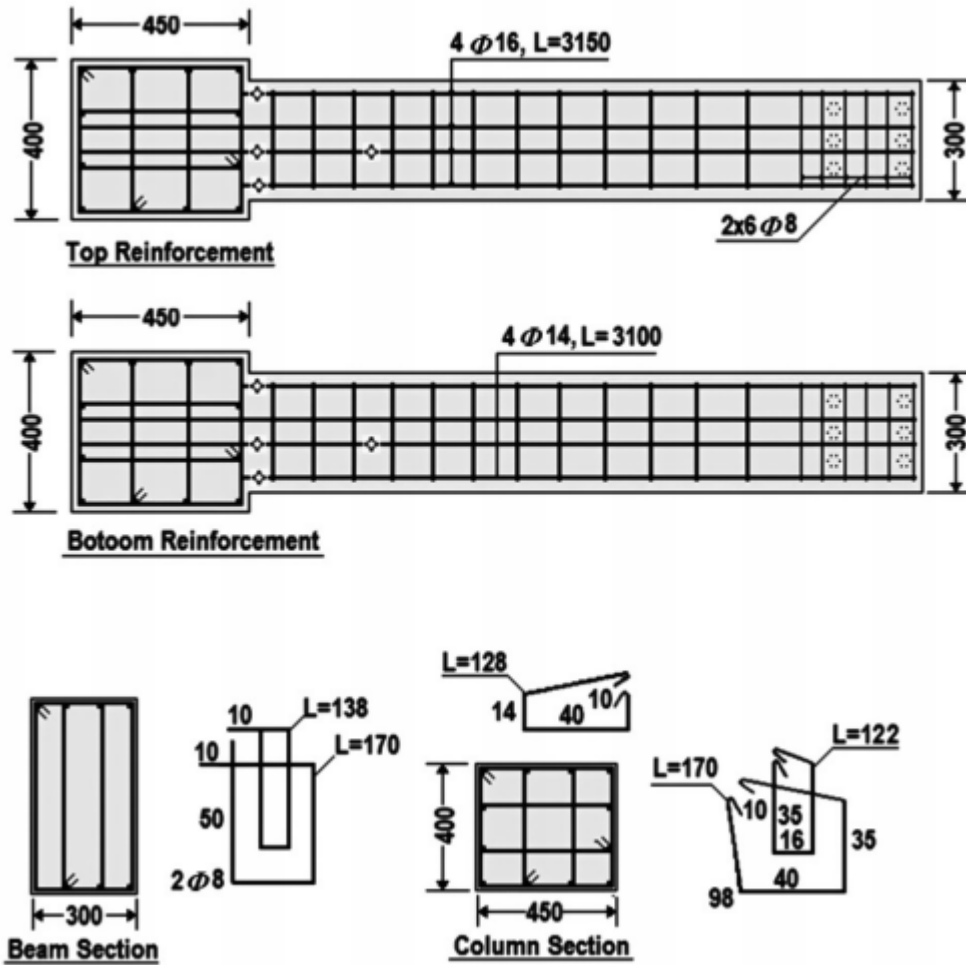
Dimensions and reinforcement details of ECBCC (Fadwa et al. (2014))
